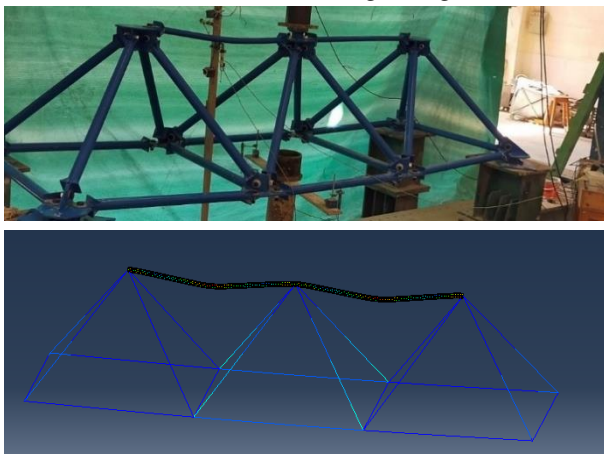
F.E. Modelling and Experimental Deformed Shape of Steel Space Truss ST1.
